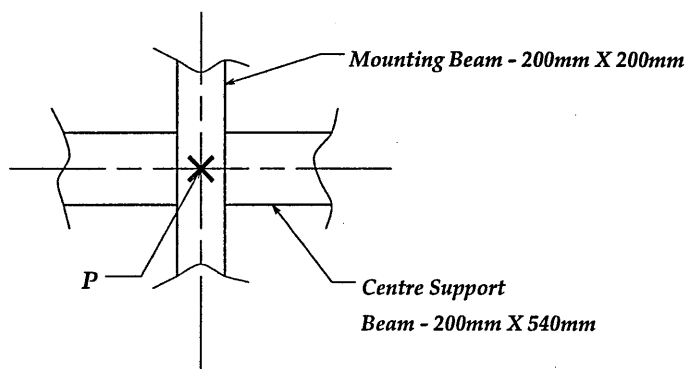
Relative Location of Load Point to Chassis Mounting Beams for Tests
